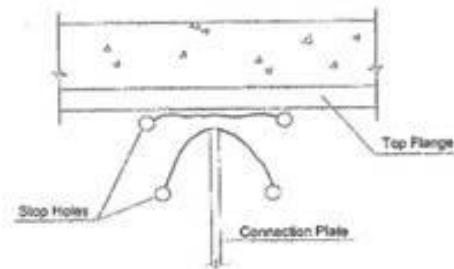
Crack-Stop Holes at Fatigue Cracks (Roddis and Zhao 2001)
